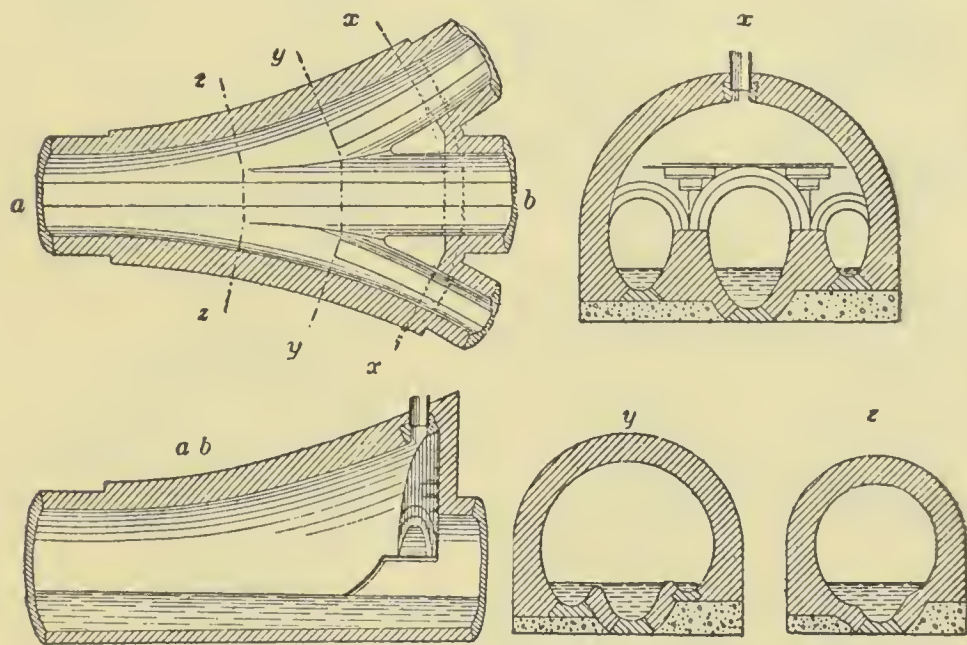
INTERSECTION OF BRICK SEWERS, FRANKFURT.
